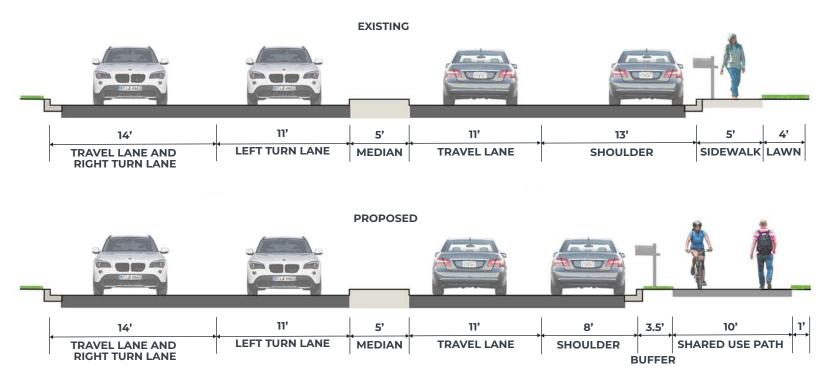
Existing roadway layout and proposed roadway adjustments to include a shared use path on Millcreek Road from McKennans Church Road to Tree Line Court.
